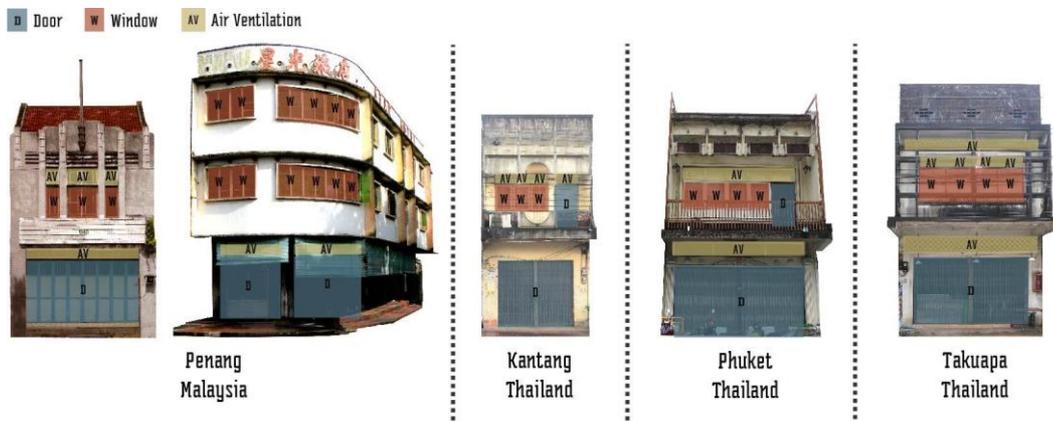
Illustration of Shophouse Façades in the Late Transitional Shophouse Style
